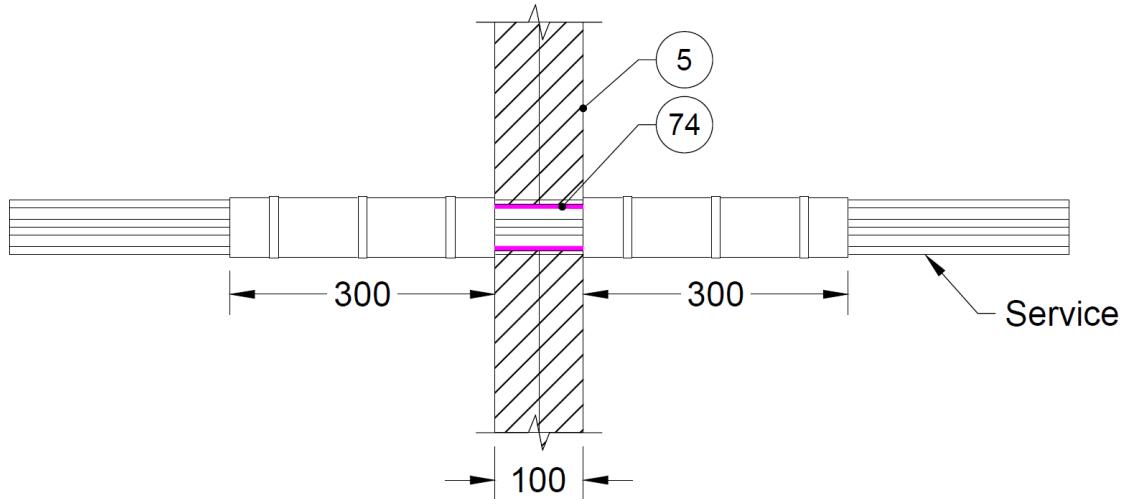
Section View of Pair coil, drain hose and cables Installed in Vertical Substrates
